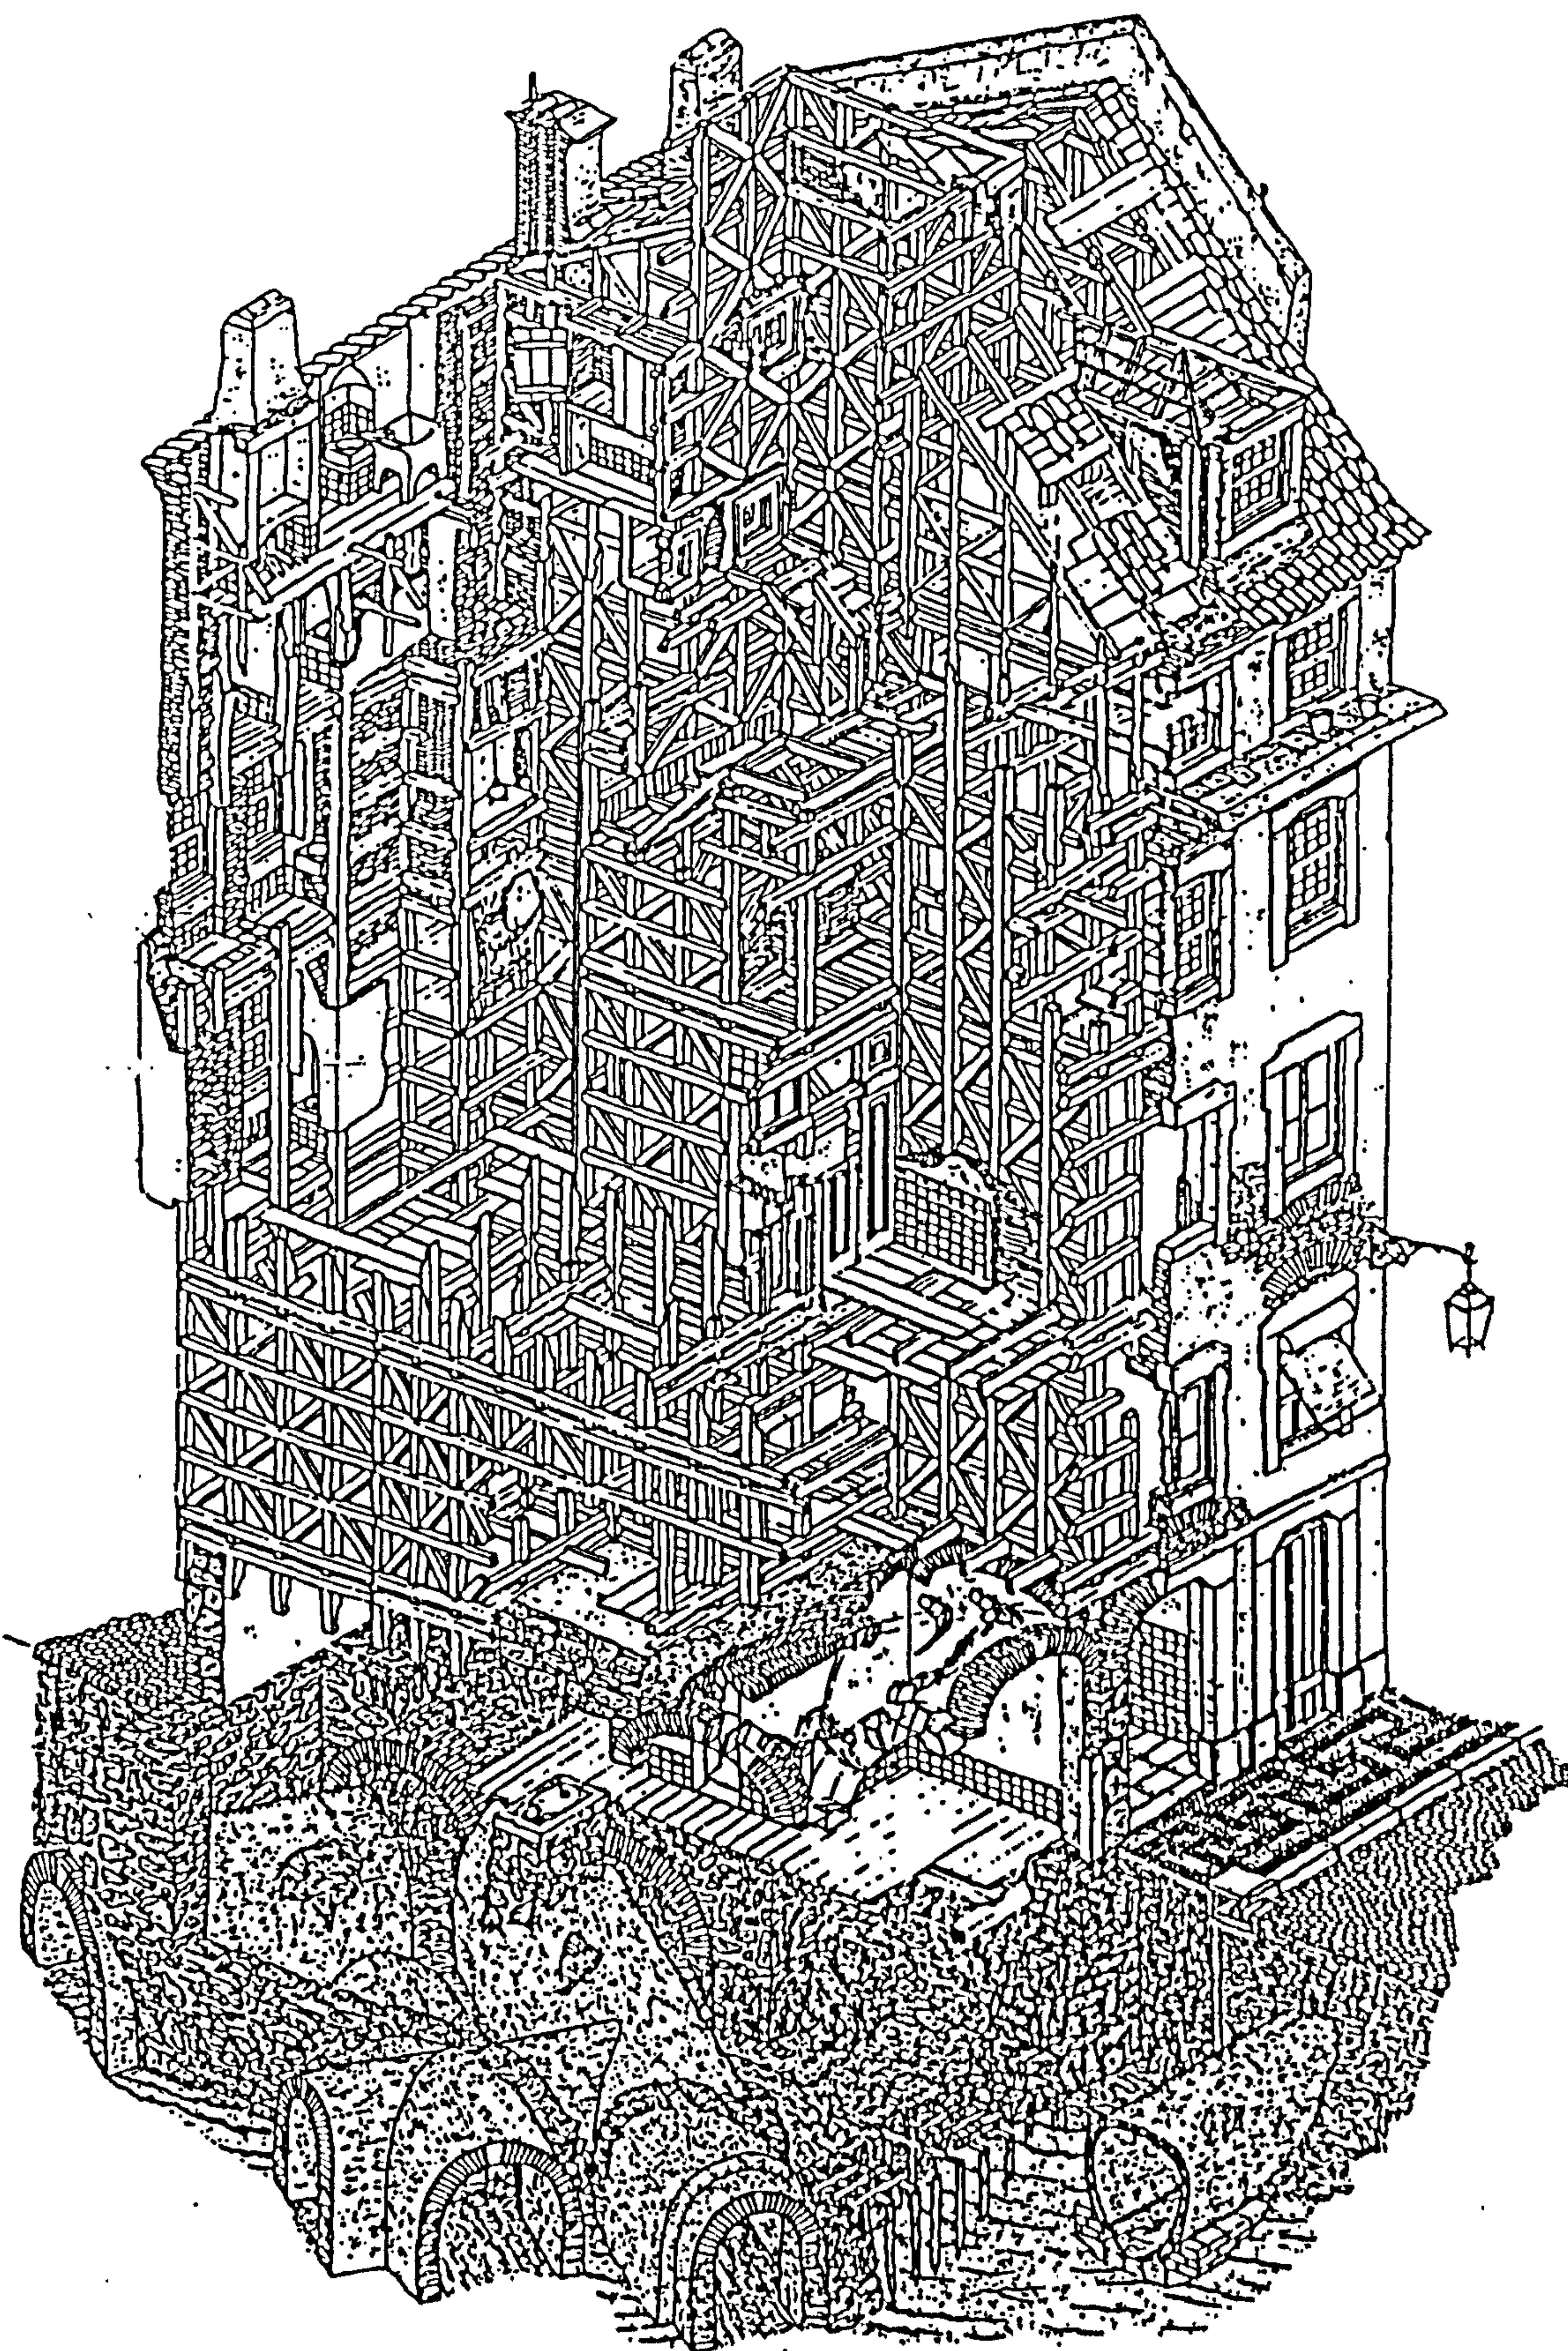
Isometric showing the construction with the later extension, (building L)
